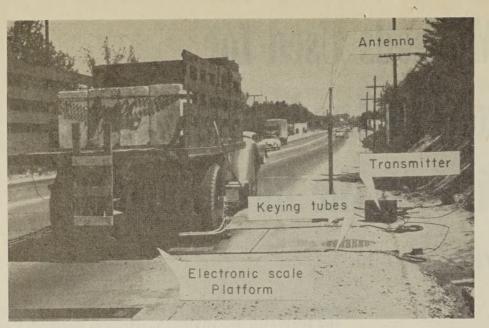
Single-unit truck equipped with apparatus used in measuring wheel loads.
